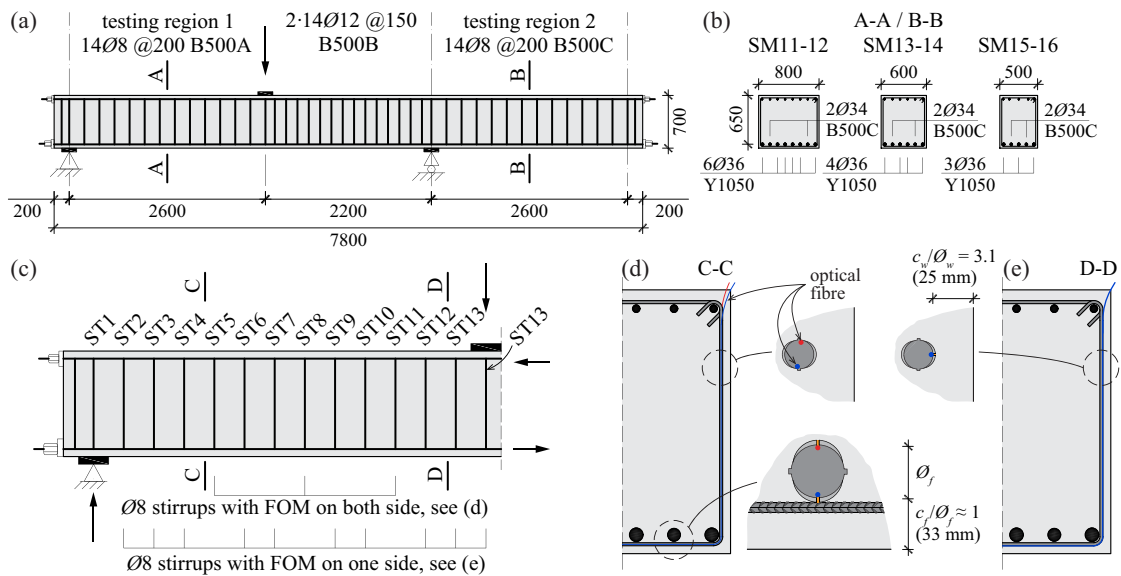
Monotonic test series SM10: (a) elevation of the test set-up; (b) cross section of the test specimens; (c) fibre instrumentation within the tested region; and details of the fibre installation in the longitudinal reinforcement and in the stirrups with (d) two sensors or (e) one sensor (for additional details, see [Mon22a]).
